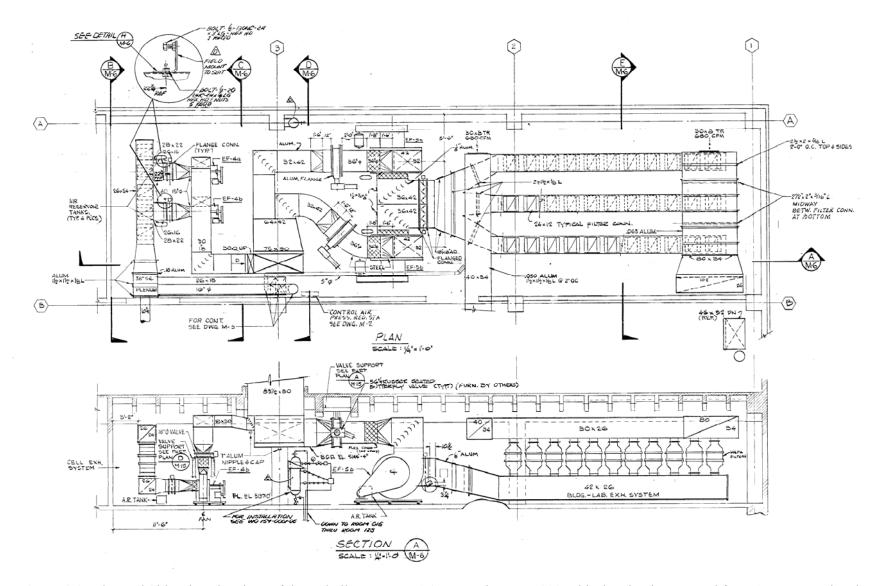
Building ventilation and process ventilation ducts at the base of the HFEF exhaust stack.
